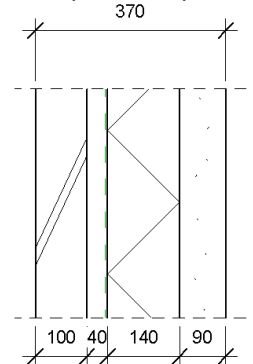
DESIGN 1 PREFAB CONCRETE
